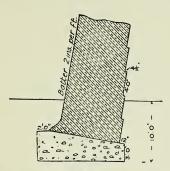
Retaining Wall Foundation on Blue Clay.
